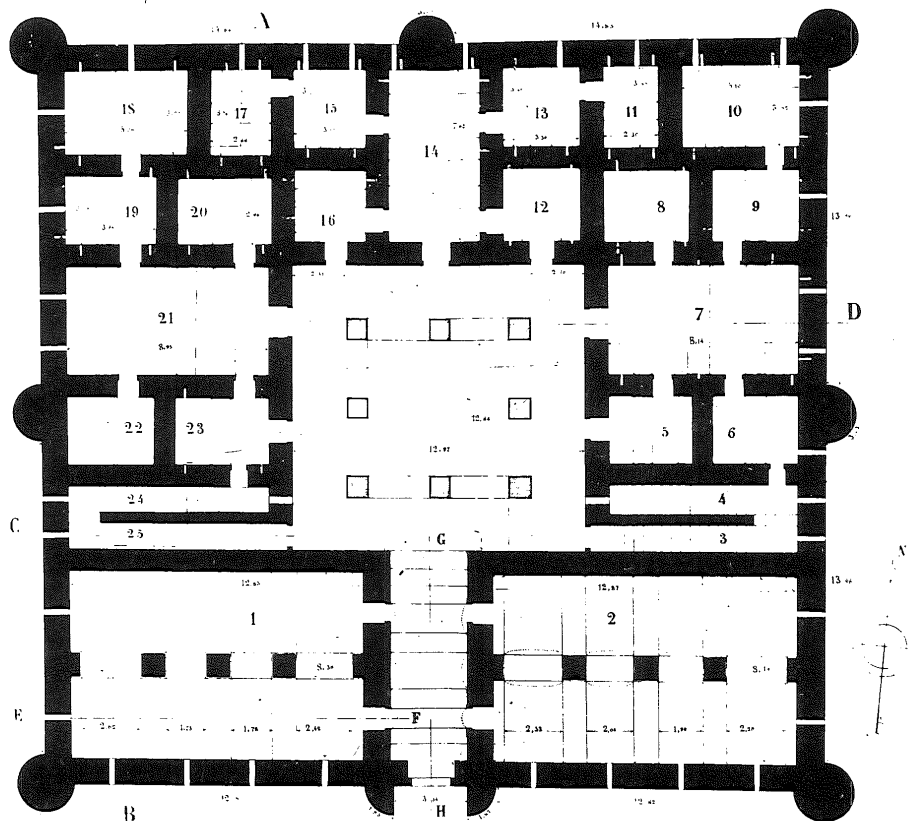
Qasr Kharana, plan. Ground floor. (After Jaussen & Savignac)
